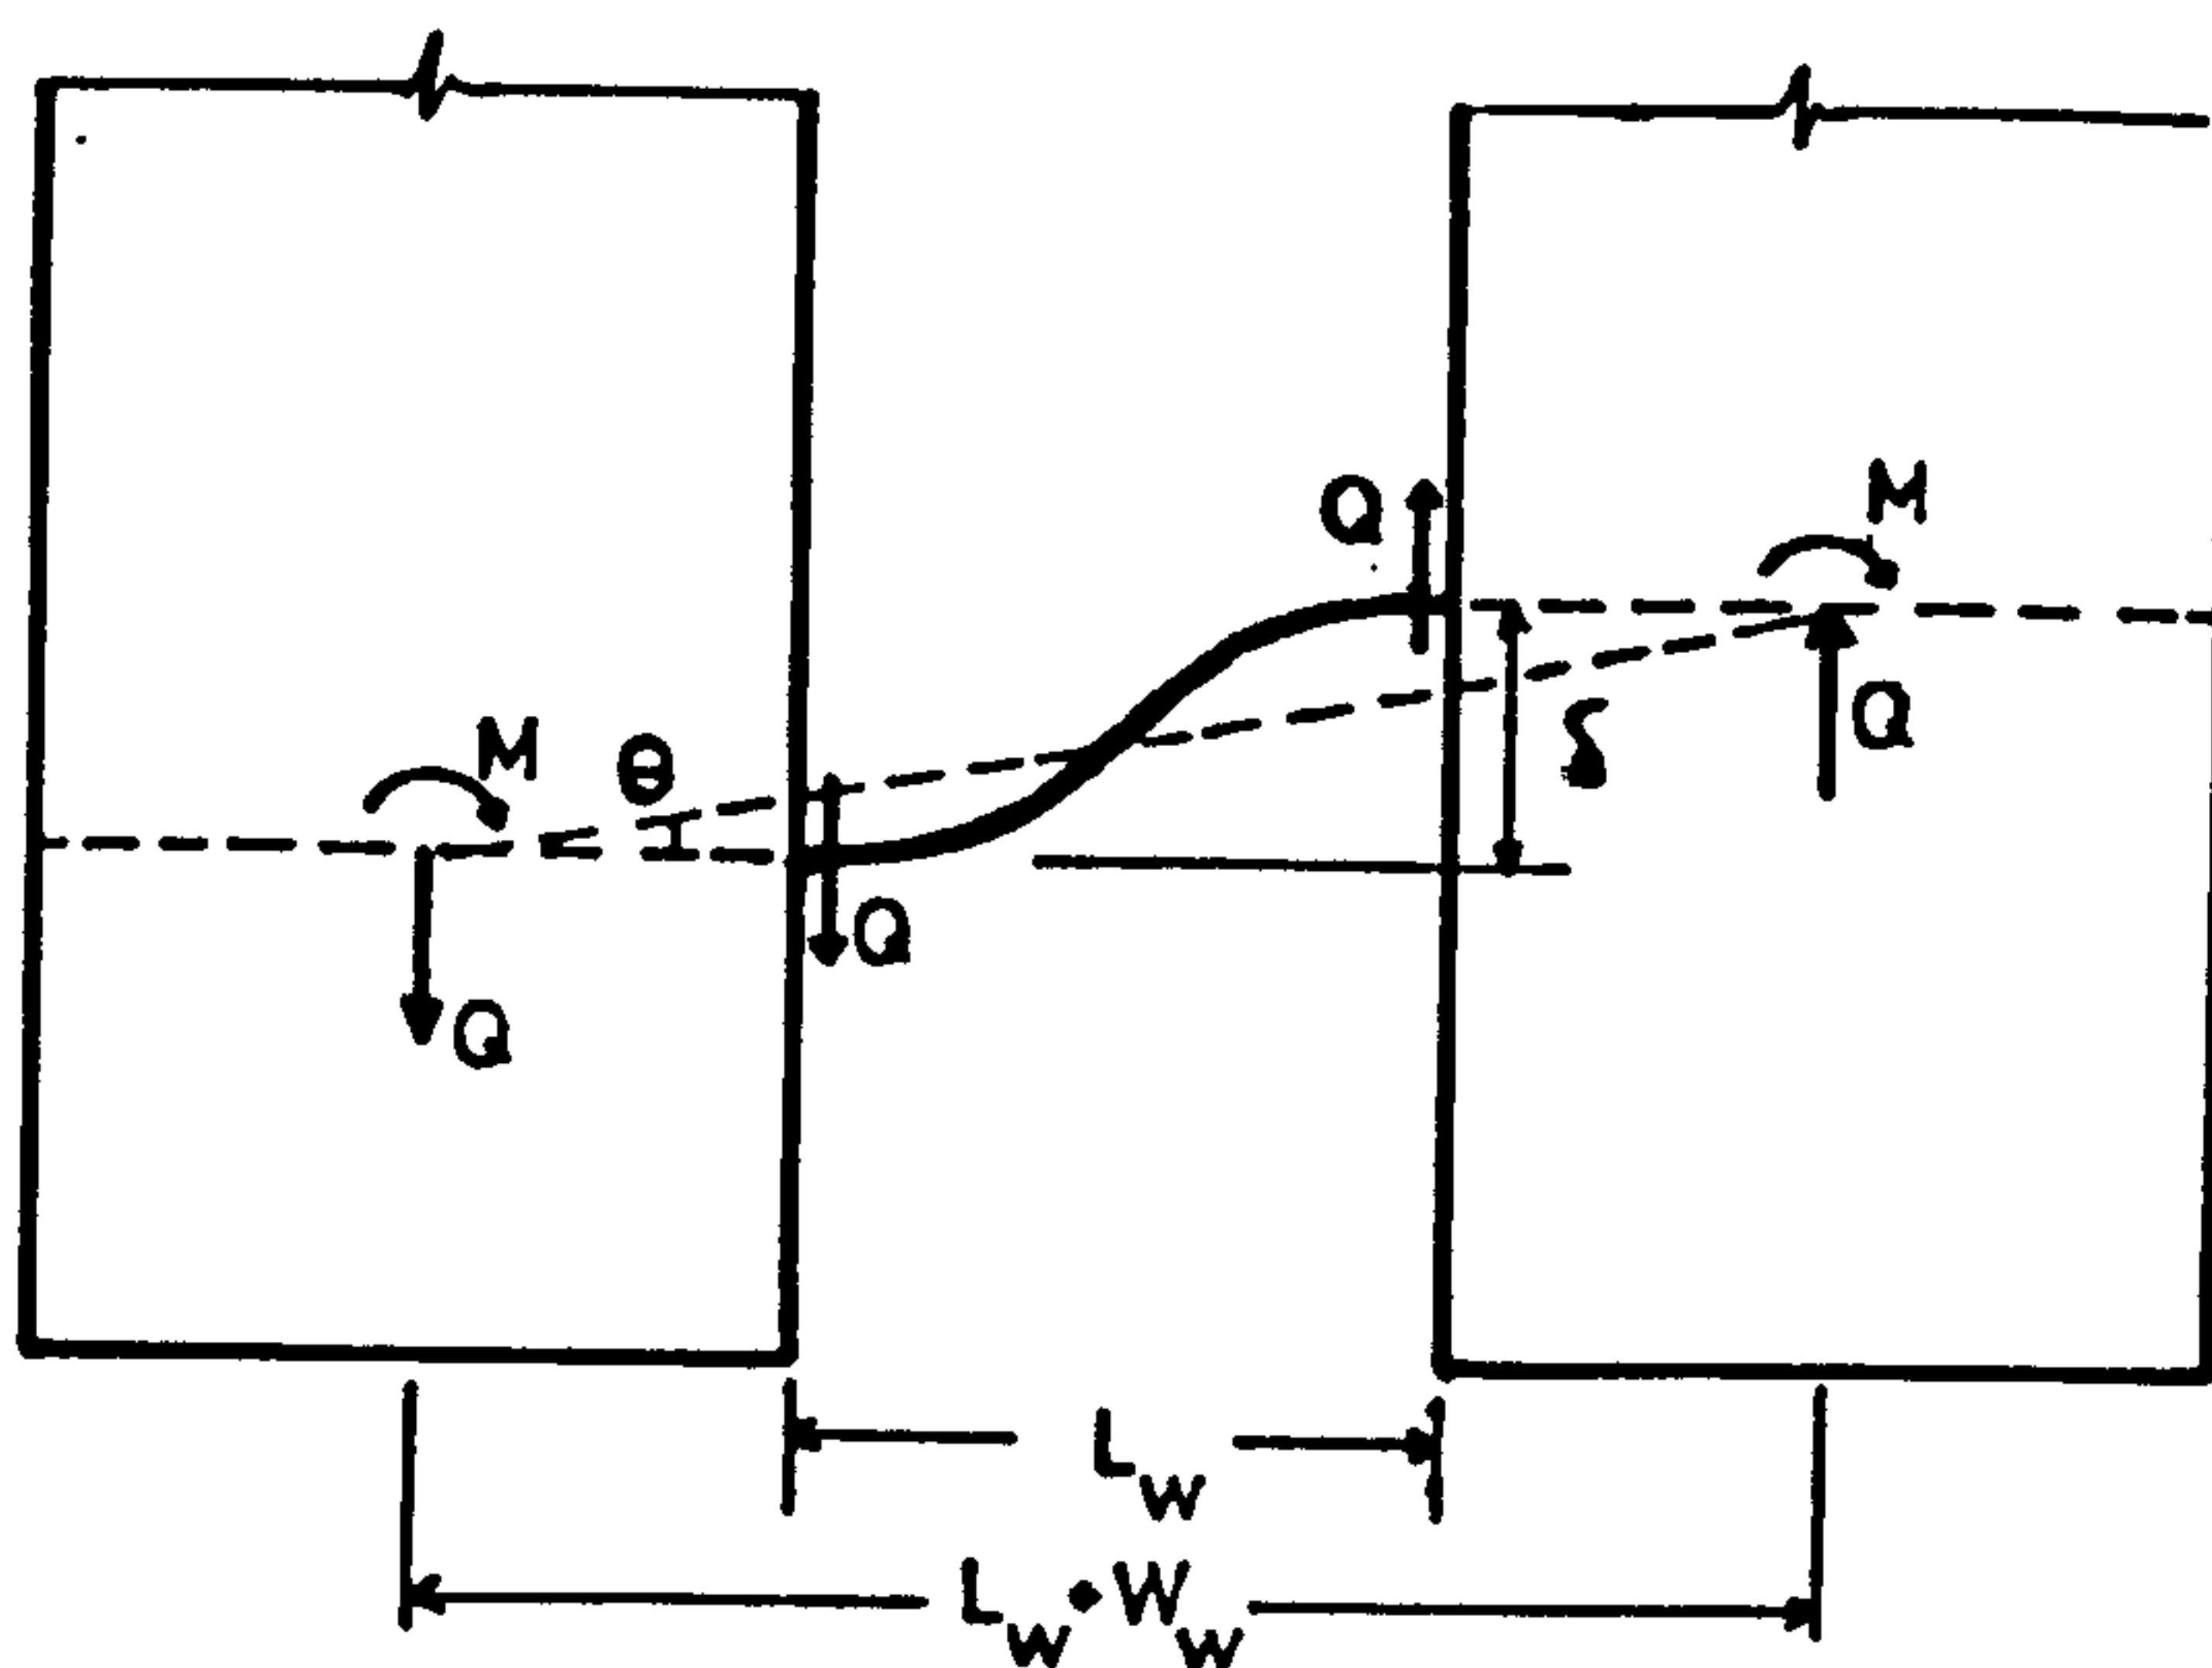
Bending of a connecting slab in a laterally loaded shear wall structure.
